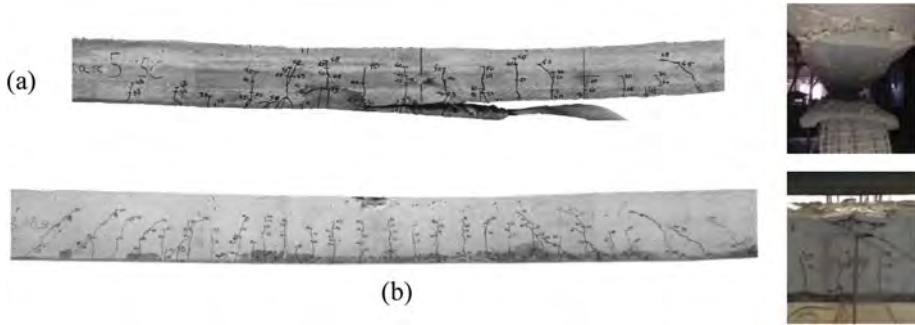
Cracking pattern and failure mode of IRS-strengthened beams: (a) beam of group A (length 3000 mm); (b) beam of group B (length 4800 mm).
